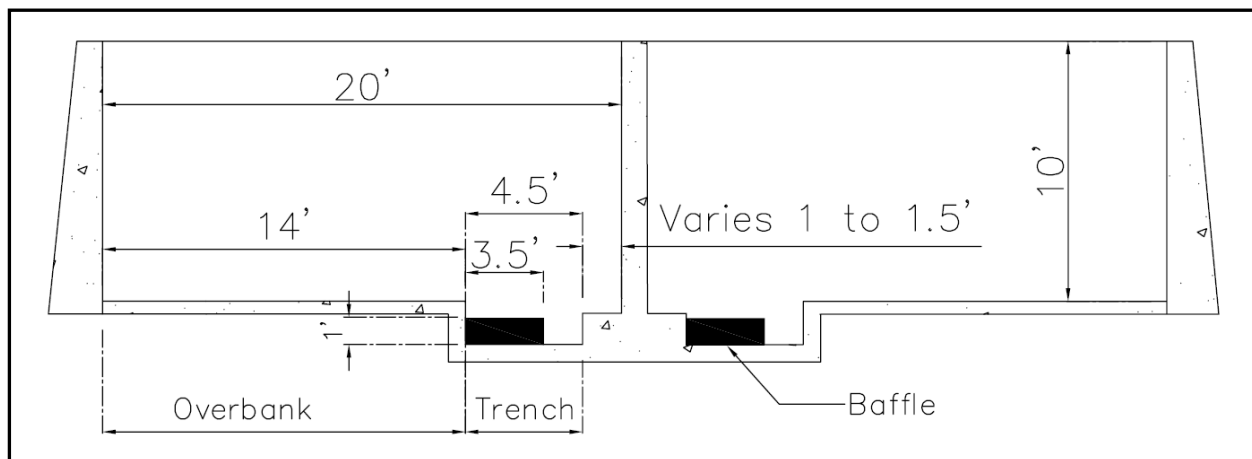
Reach Type 7 Layout and Dimensions.
